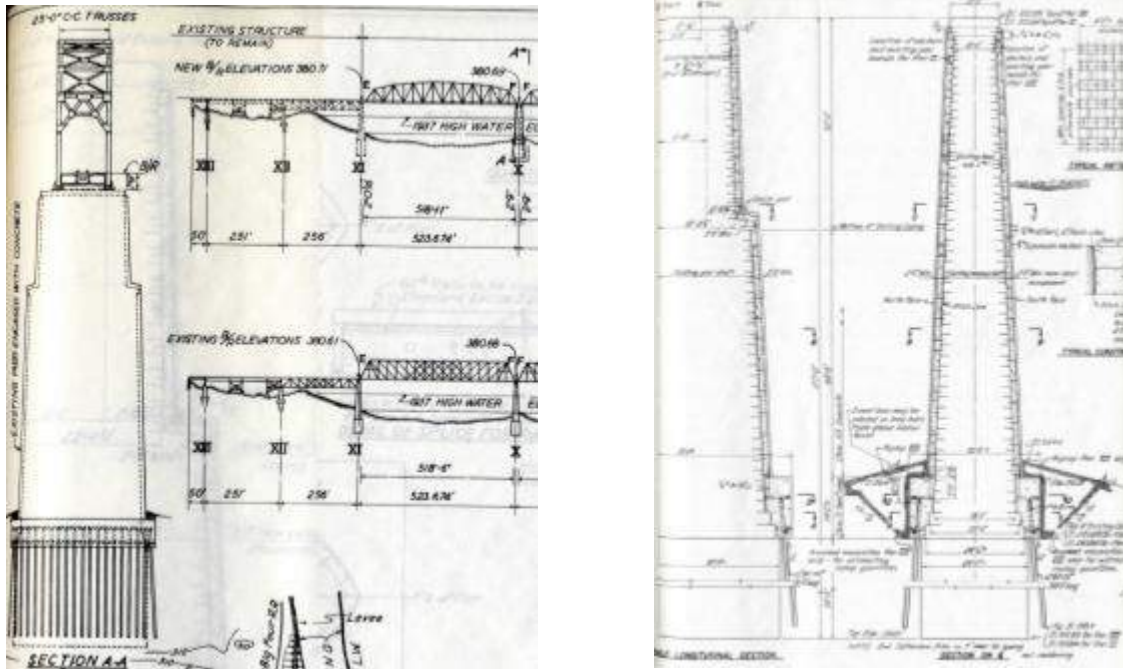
Elevation and Lateral Views of a Pier of Cairo Railroad Bridge
